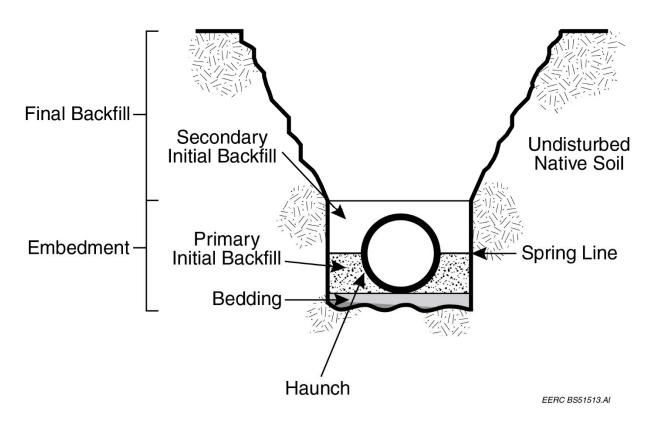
Cross section of pipeline trench and backfill stages (Plastic Pipes Institute, 2009).
